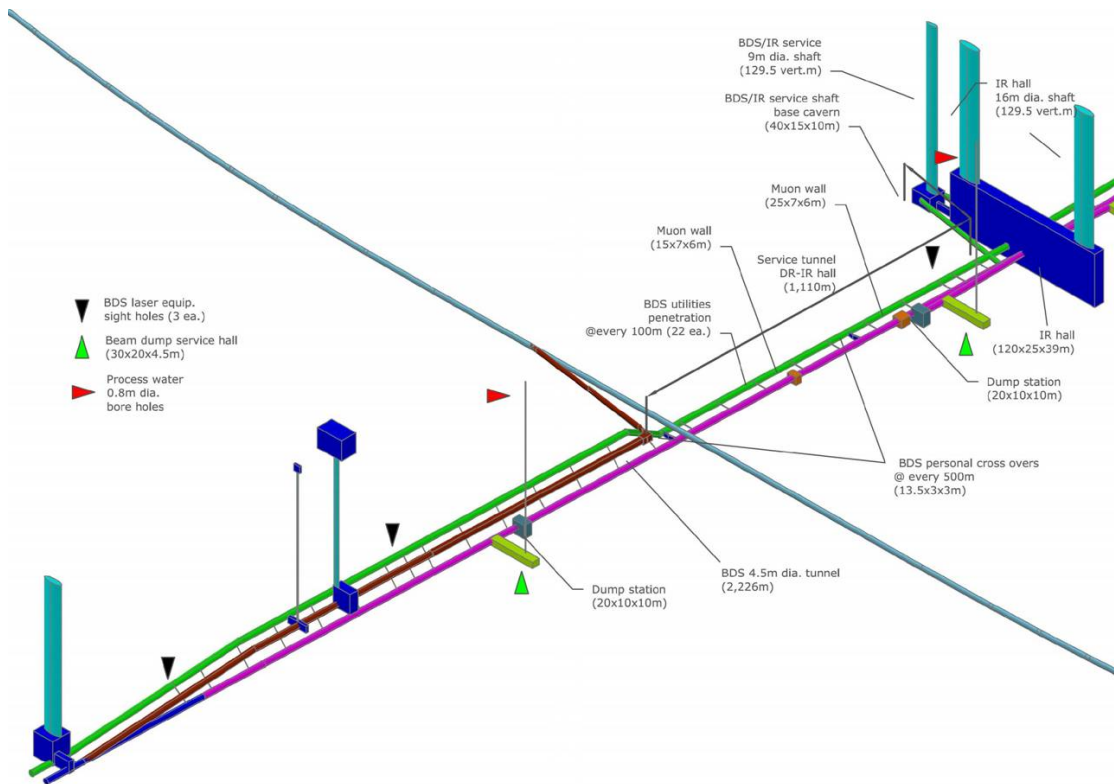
BDS layout, beam and service tunnels (shown in magenta and green), shafts, experimental hall.
